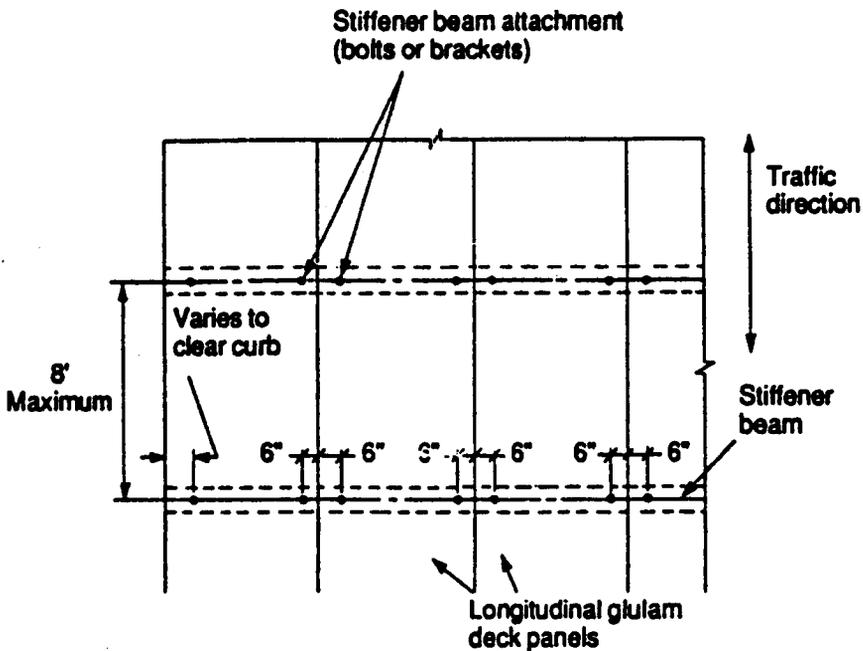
Stiffener-beam attachment for longitudinal glulam decks.
